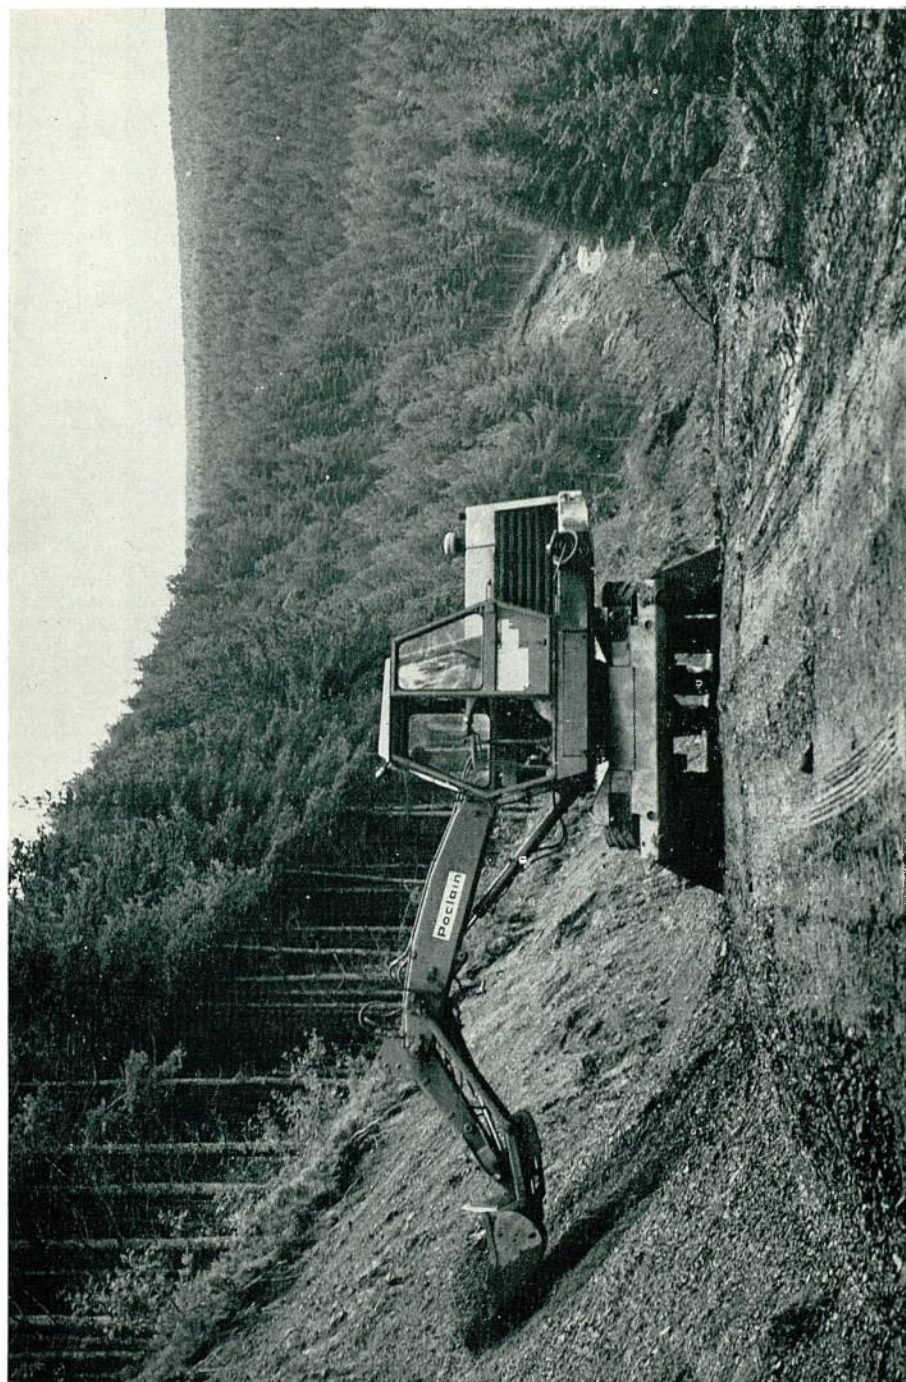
Road construction. A giant powered shovel excavates a road bed formation out of a steep hillside at Rheola, in Coed Morgannwg, South Wales.
